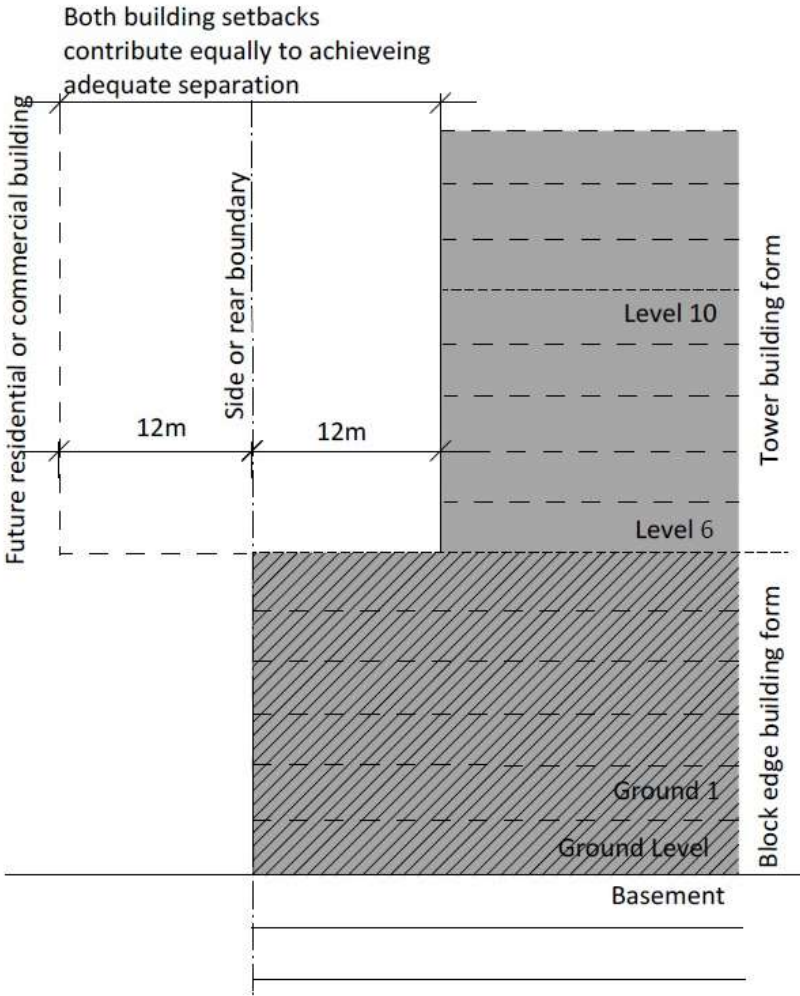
Elevation - Side and rear boundary setbacks to prevent overlooking
